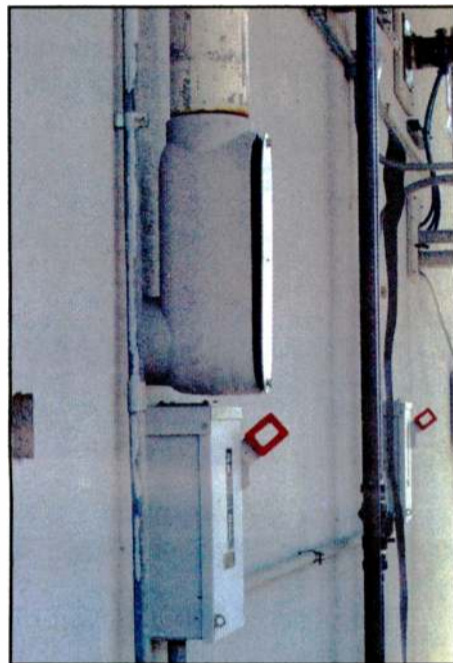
Ensure that electrical wiring outside the building is free from water entry. Torrential rains can possibly short out the wirings inside this conduit.
